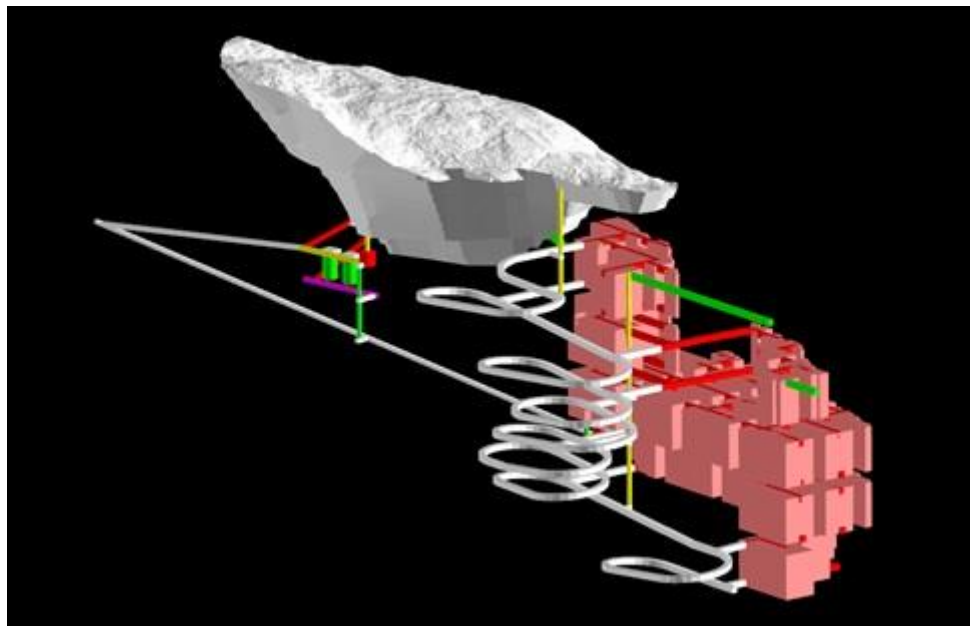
Open Pit and Underground Mine Design (looking South-East)
